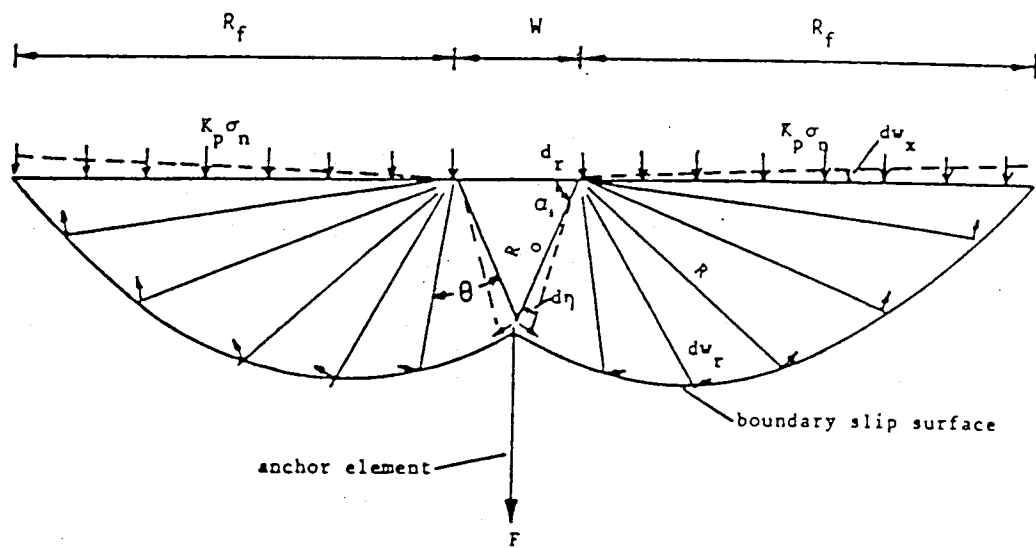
Collapse Mechanism for Anchor Pullout (Murray 1983)
